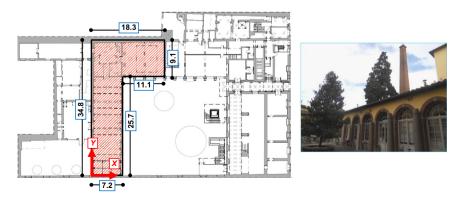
Plan of the ground floor of Opificio delle Pietre Dure Institute, with the main hall of the Laboratories of Stones and Bronzes highlighted by a hatched background (dimensions in metres), and view of the building façade.
